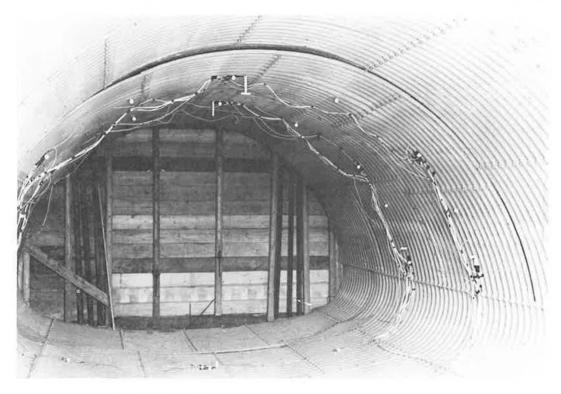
Inside of pipe arch with bulge-shaped deformations on either side of crest. Center section of structure clearly deflected against adjacent rings.
